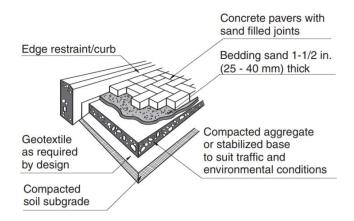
Typical component of Interlocking Concrete pavers system (Mujaj and Smith, 2001).
